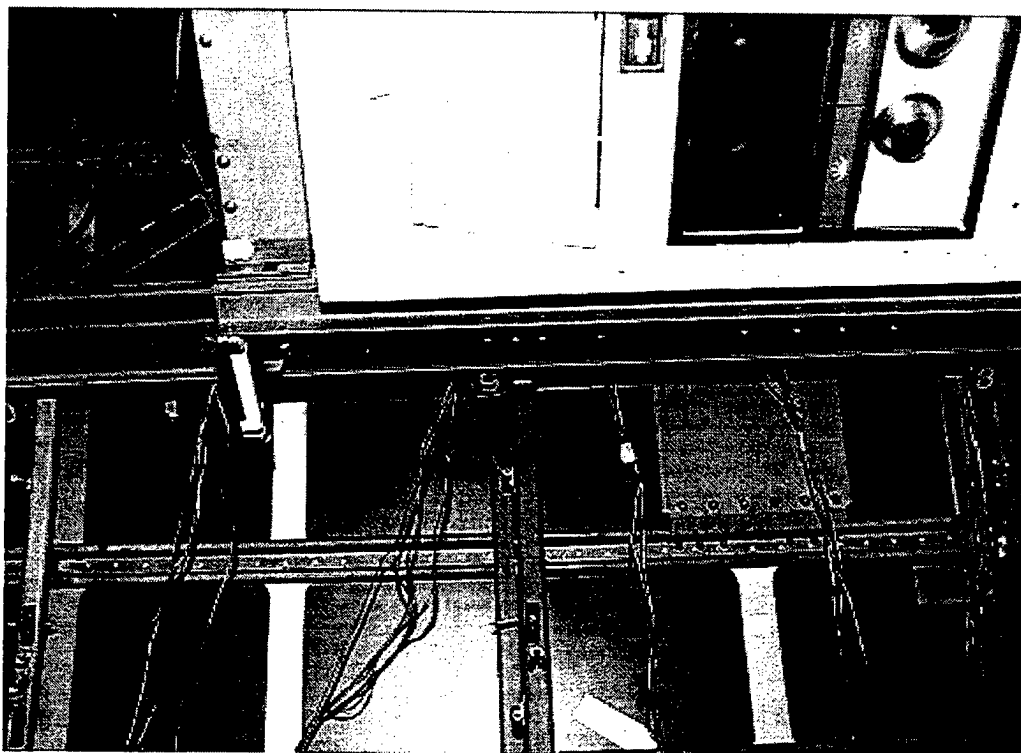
PRETEST BIN B SUPPORTS 8, 9, AND 10 BOTTOM VIEW
